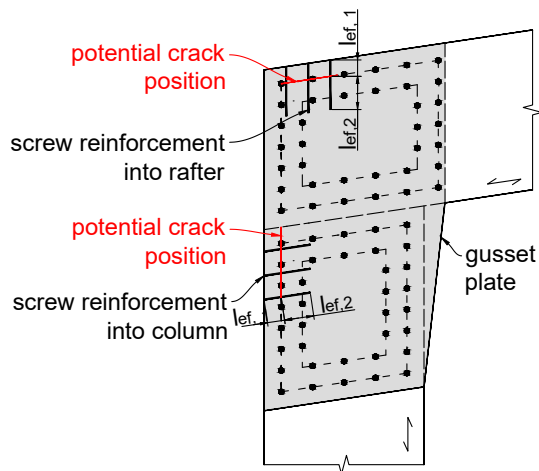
Corner reinforcement (gravity load case) with a gusset plate.
